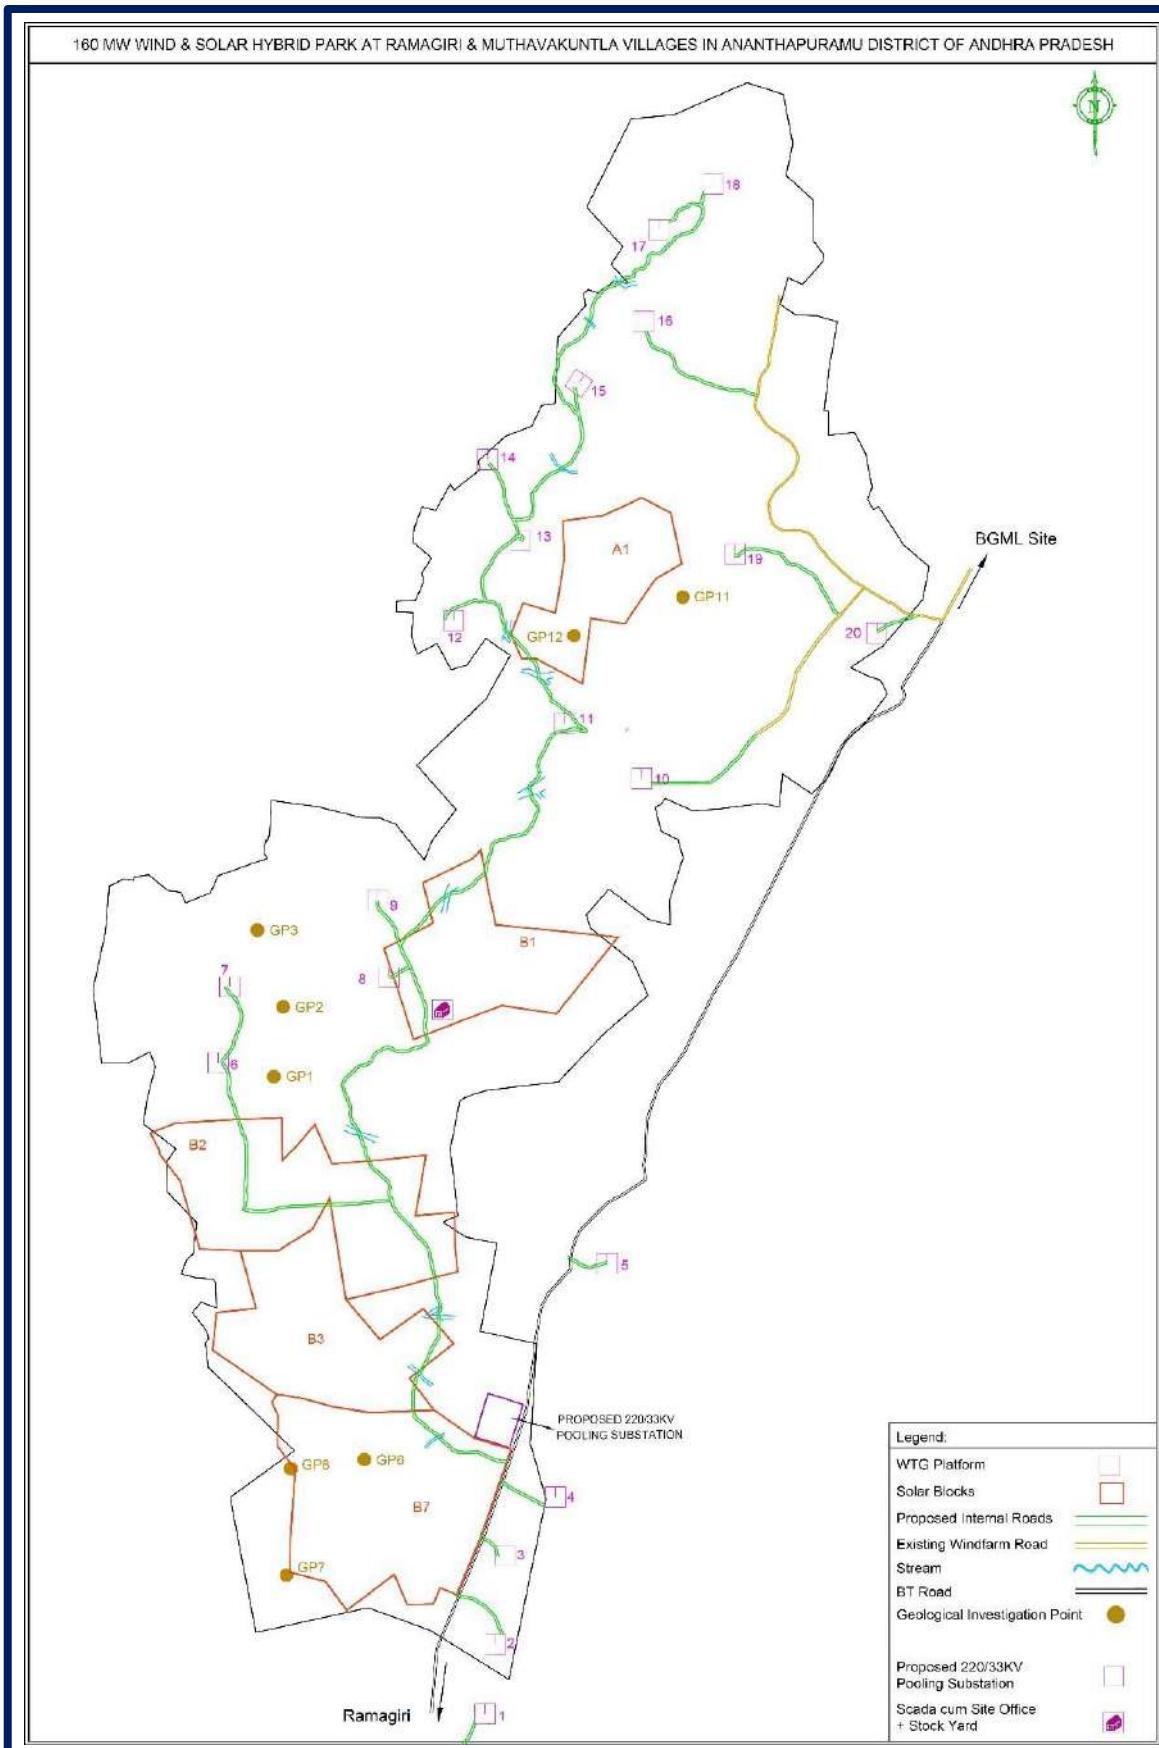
Solar Park Layout Showing Proposed Bore Well Locations
